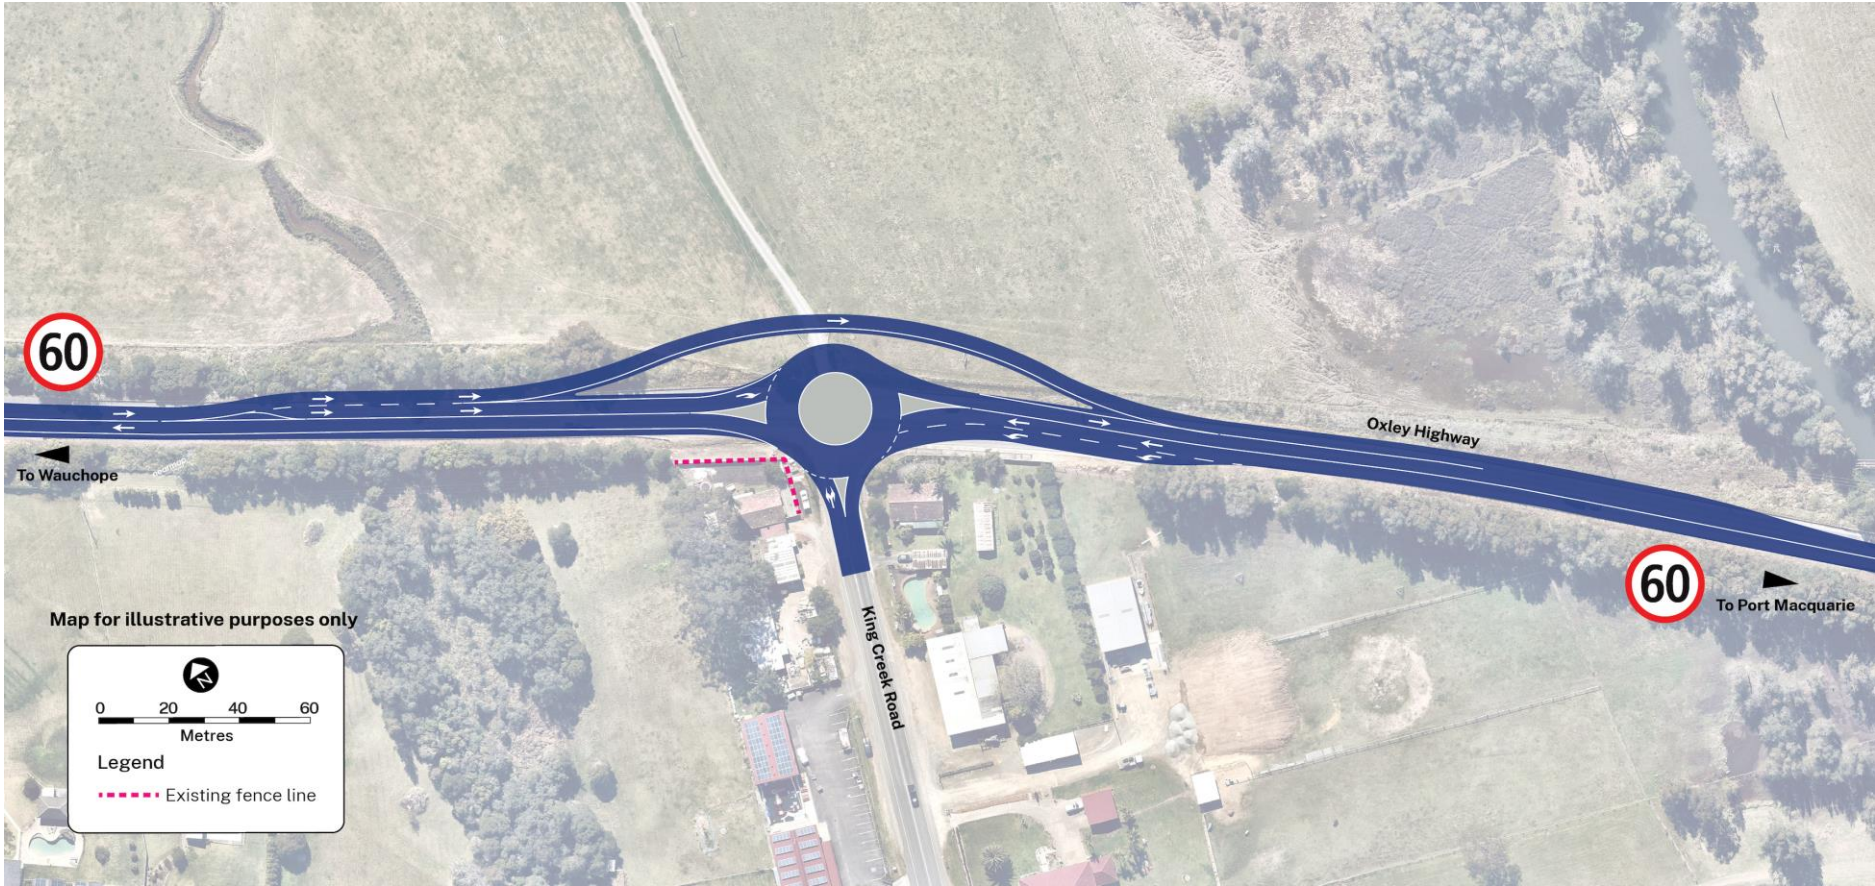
Proposed concept design at the Oxley Highway and King Creek Road intersection, July 2023
